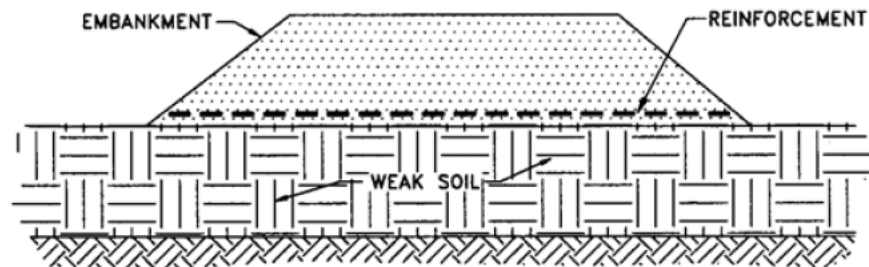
Example of reinforced embankment application (Schaefer et al. 2017b).
